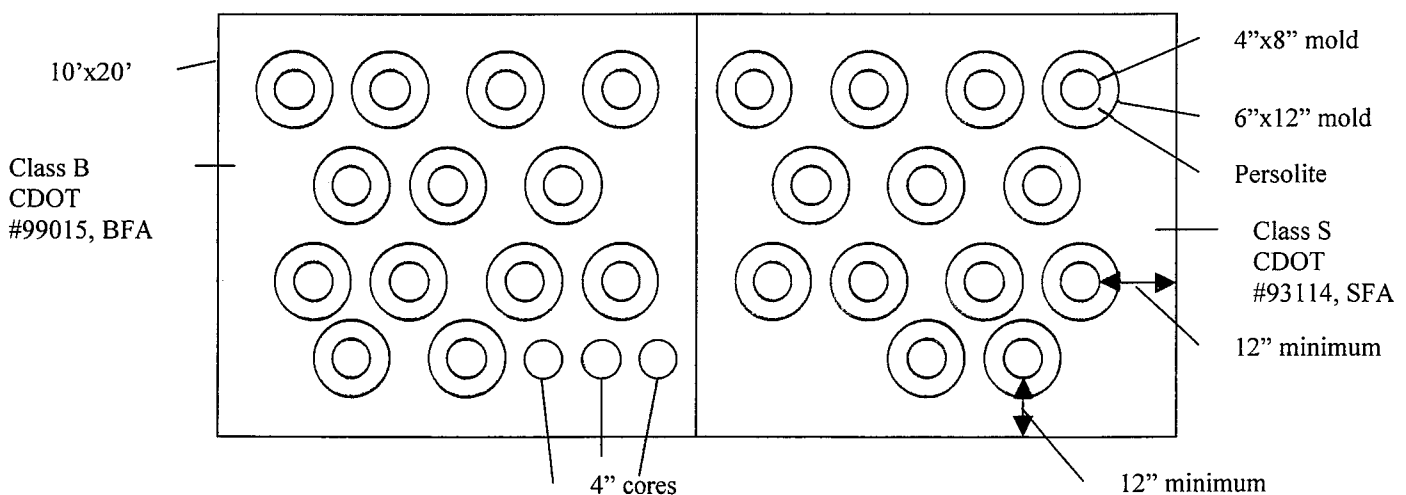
Condition #5; slab on grade (plan view, not shown to scale).
